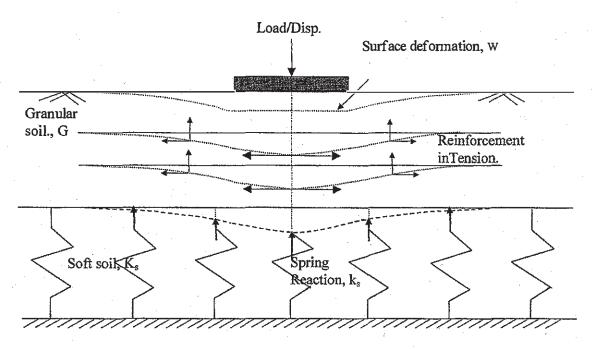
Tensile membrane mechanism - two layers reinforced foundation bed.
